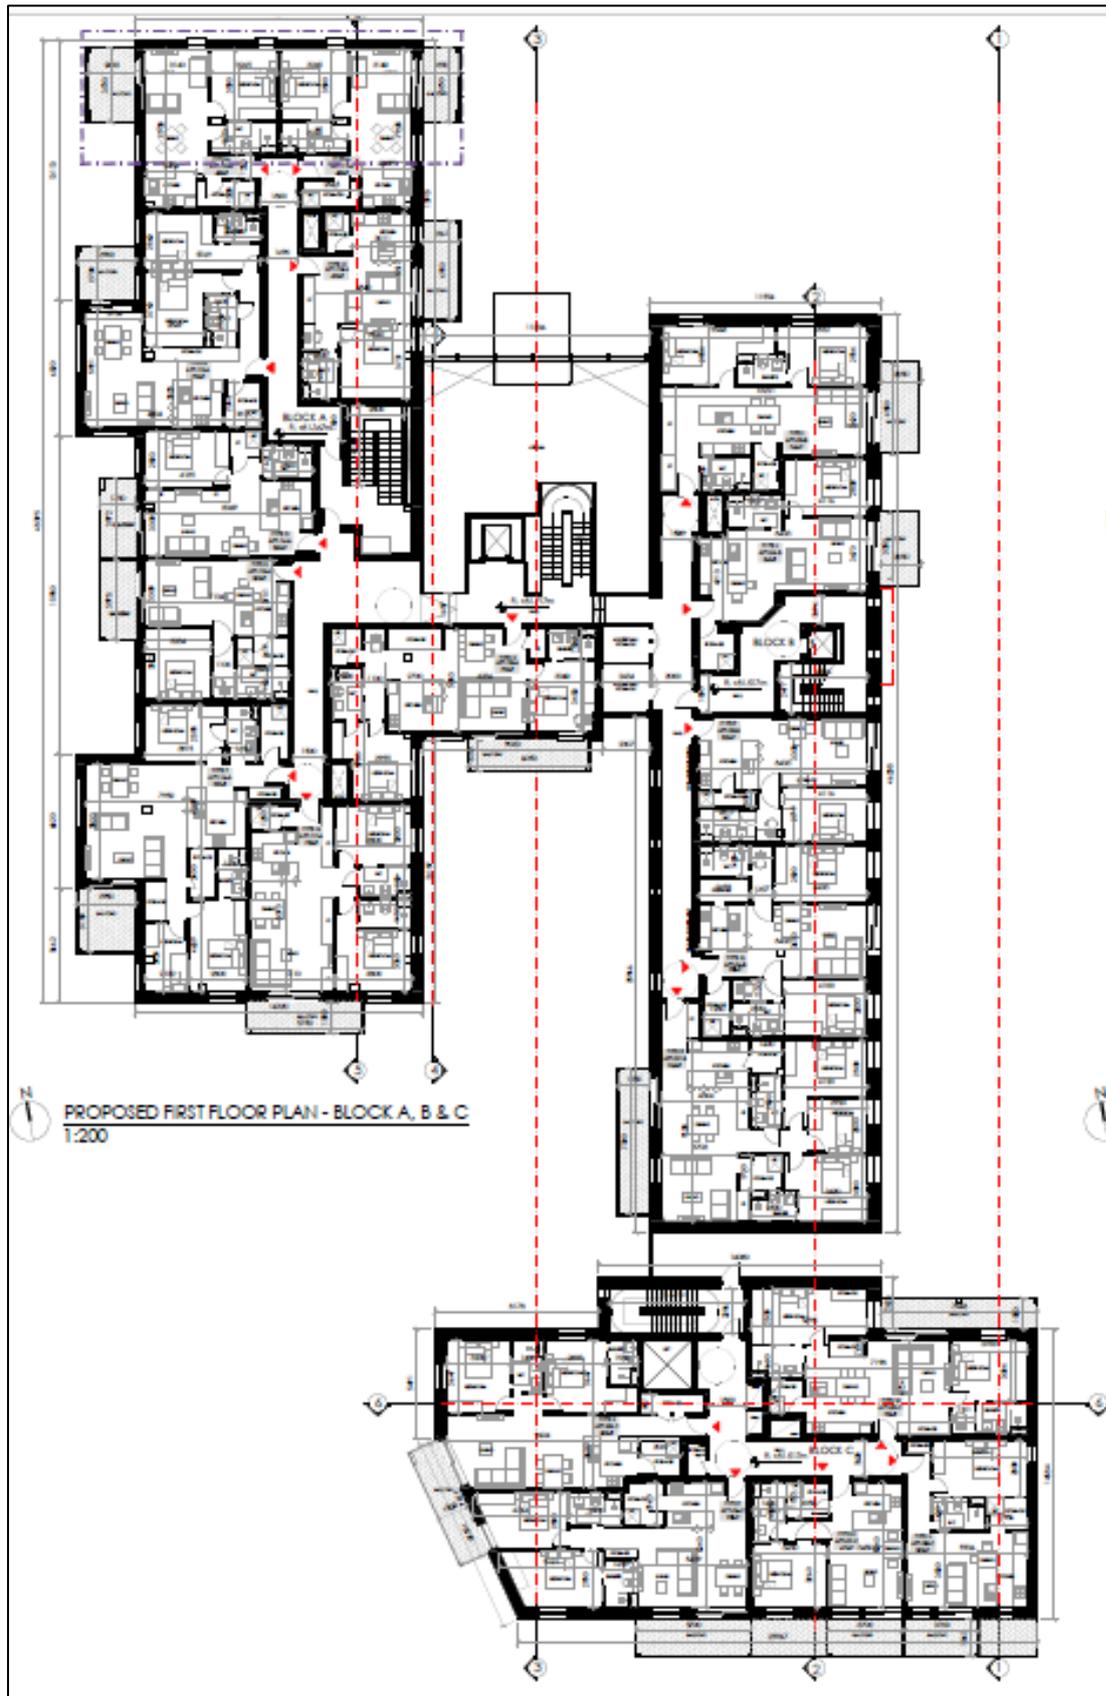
First floor plan of the proposed Blocks A, B and C
